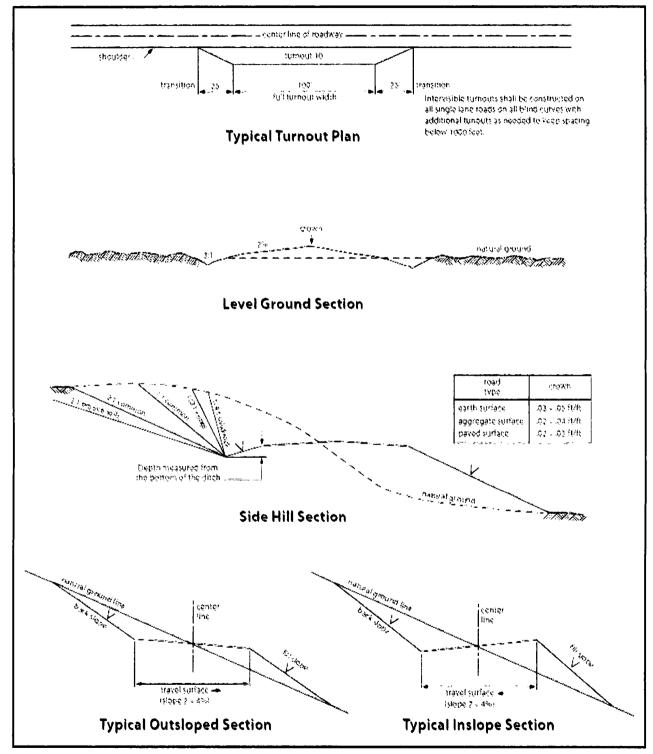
Cross-sections and plans for typical road sections representative of BLM resource or FS local and higher-class roads.
